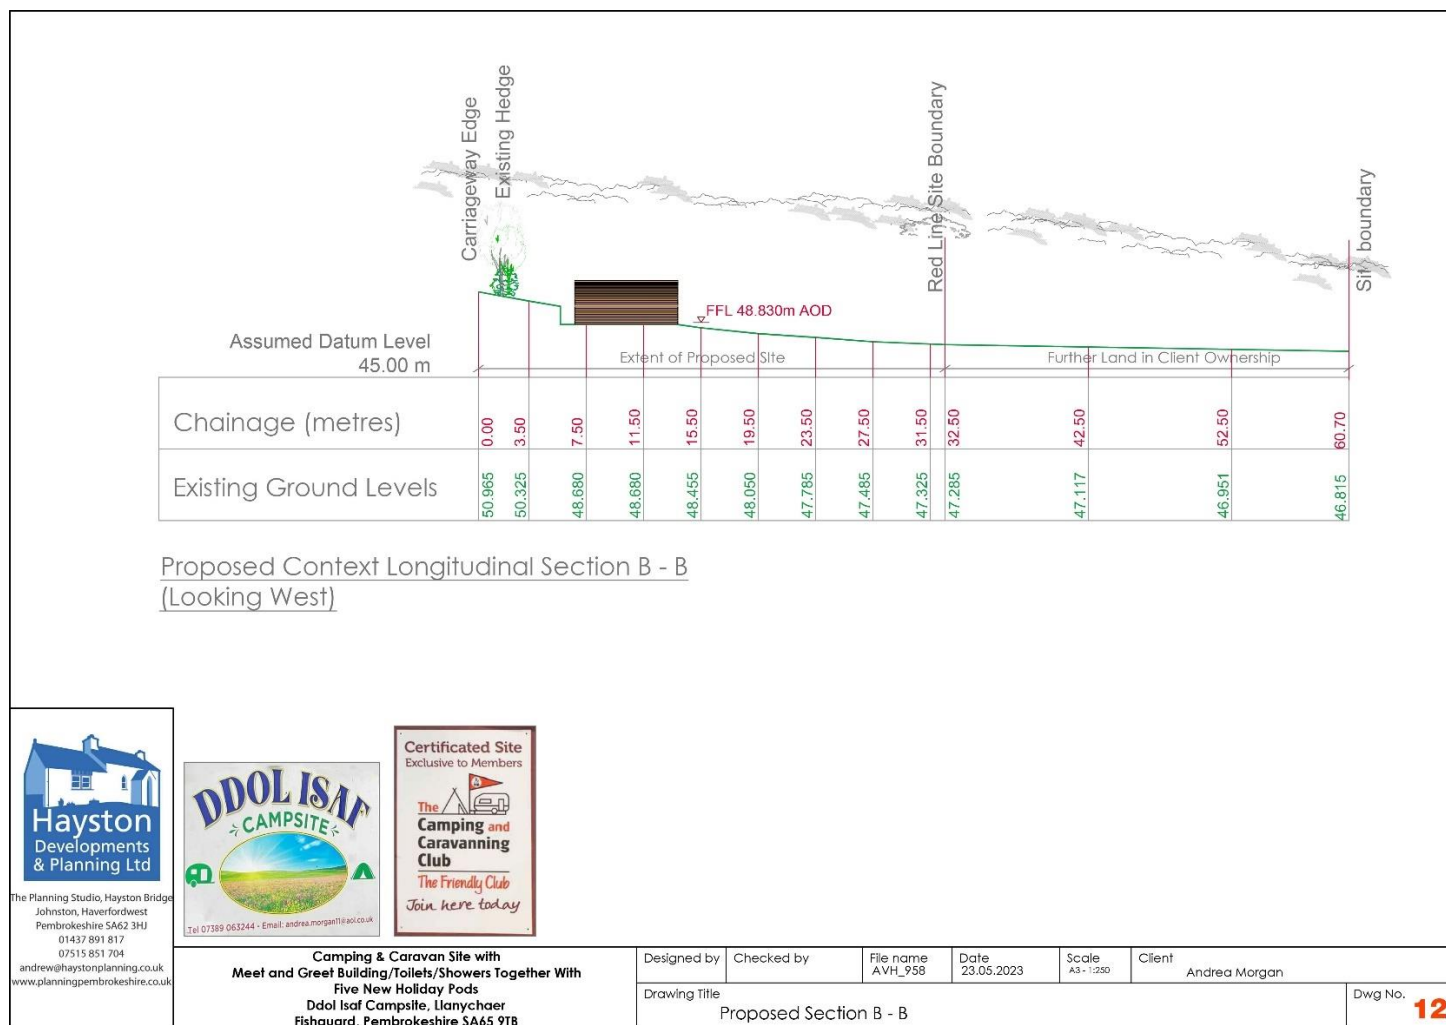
Proposed section through the site, showing the terracing for the camping pods. Plan provided by the client, not reproduced to scale.
